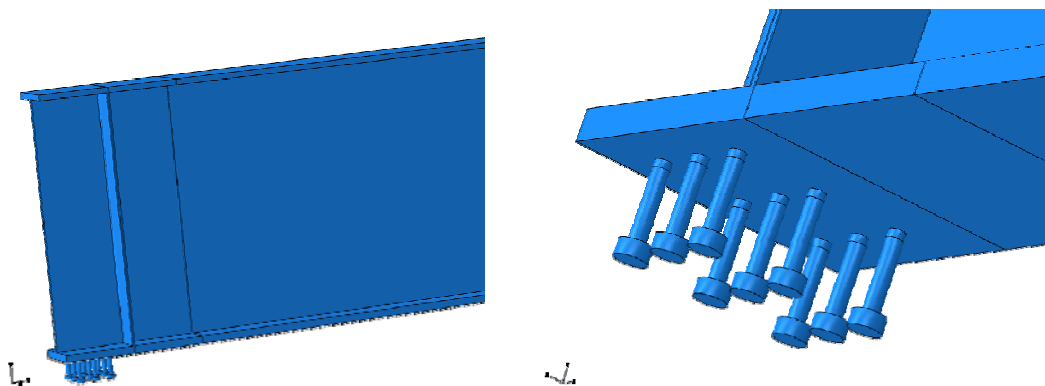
Shear Studs Attached to the Girder Bottom Flange
